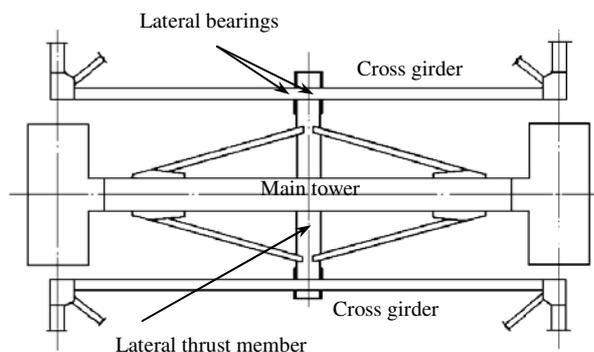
Arrangement of Lateral Bearings at Main Towers
